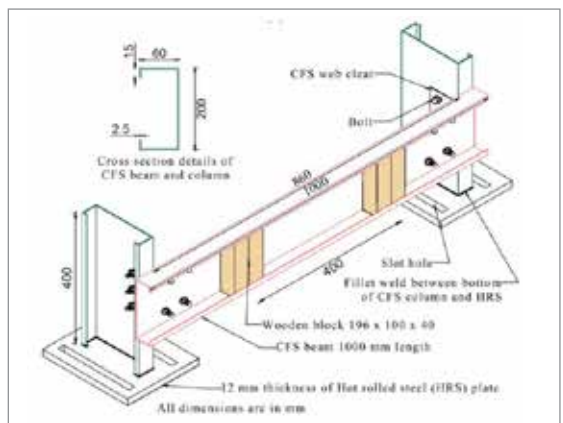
Experimental study of Beam-to-Column connection by bolted clip-angle
